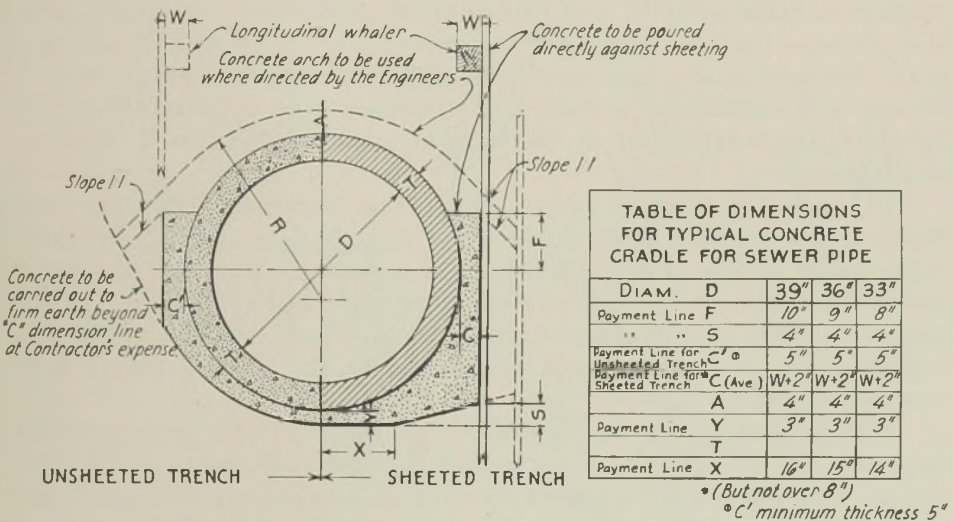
Typical concrete cradle section for unreinforced concrete pipe.
